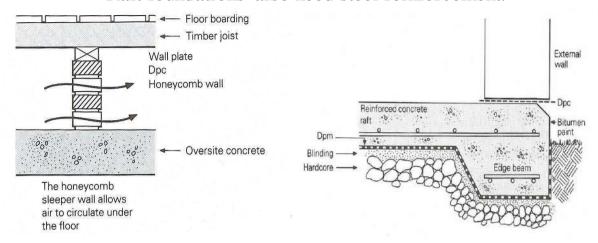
Oversite Concrete Floor Figure 11.3 Raft Foundation below a Suspended Ttimber Floor
